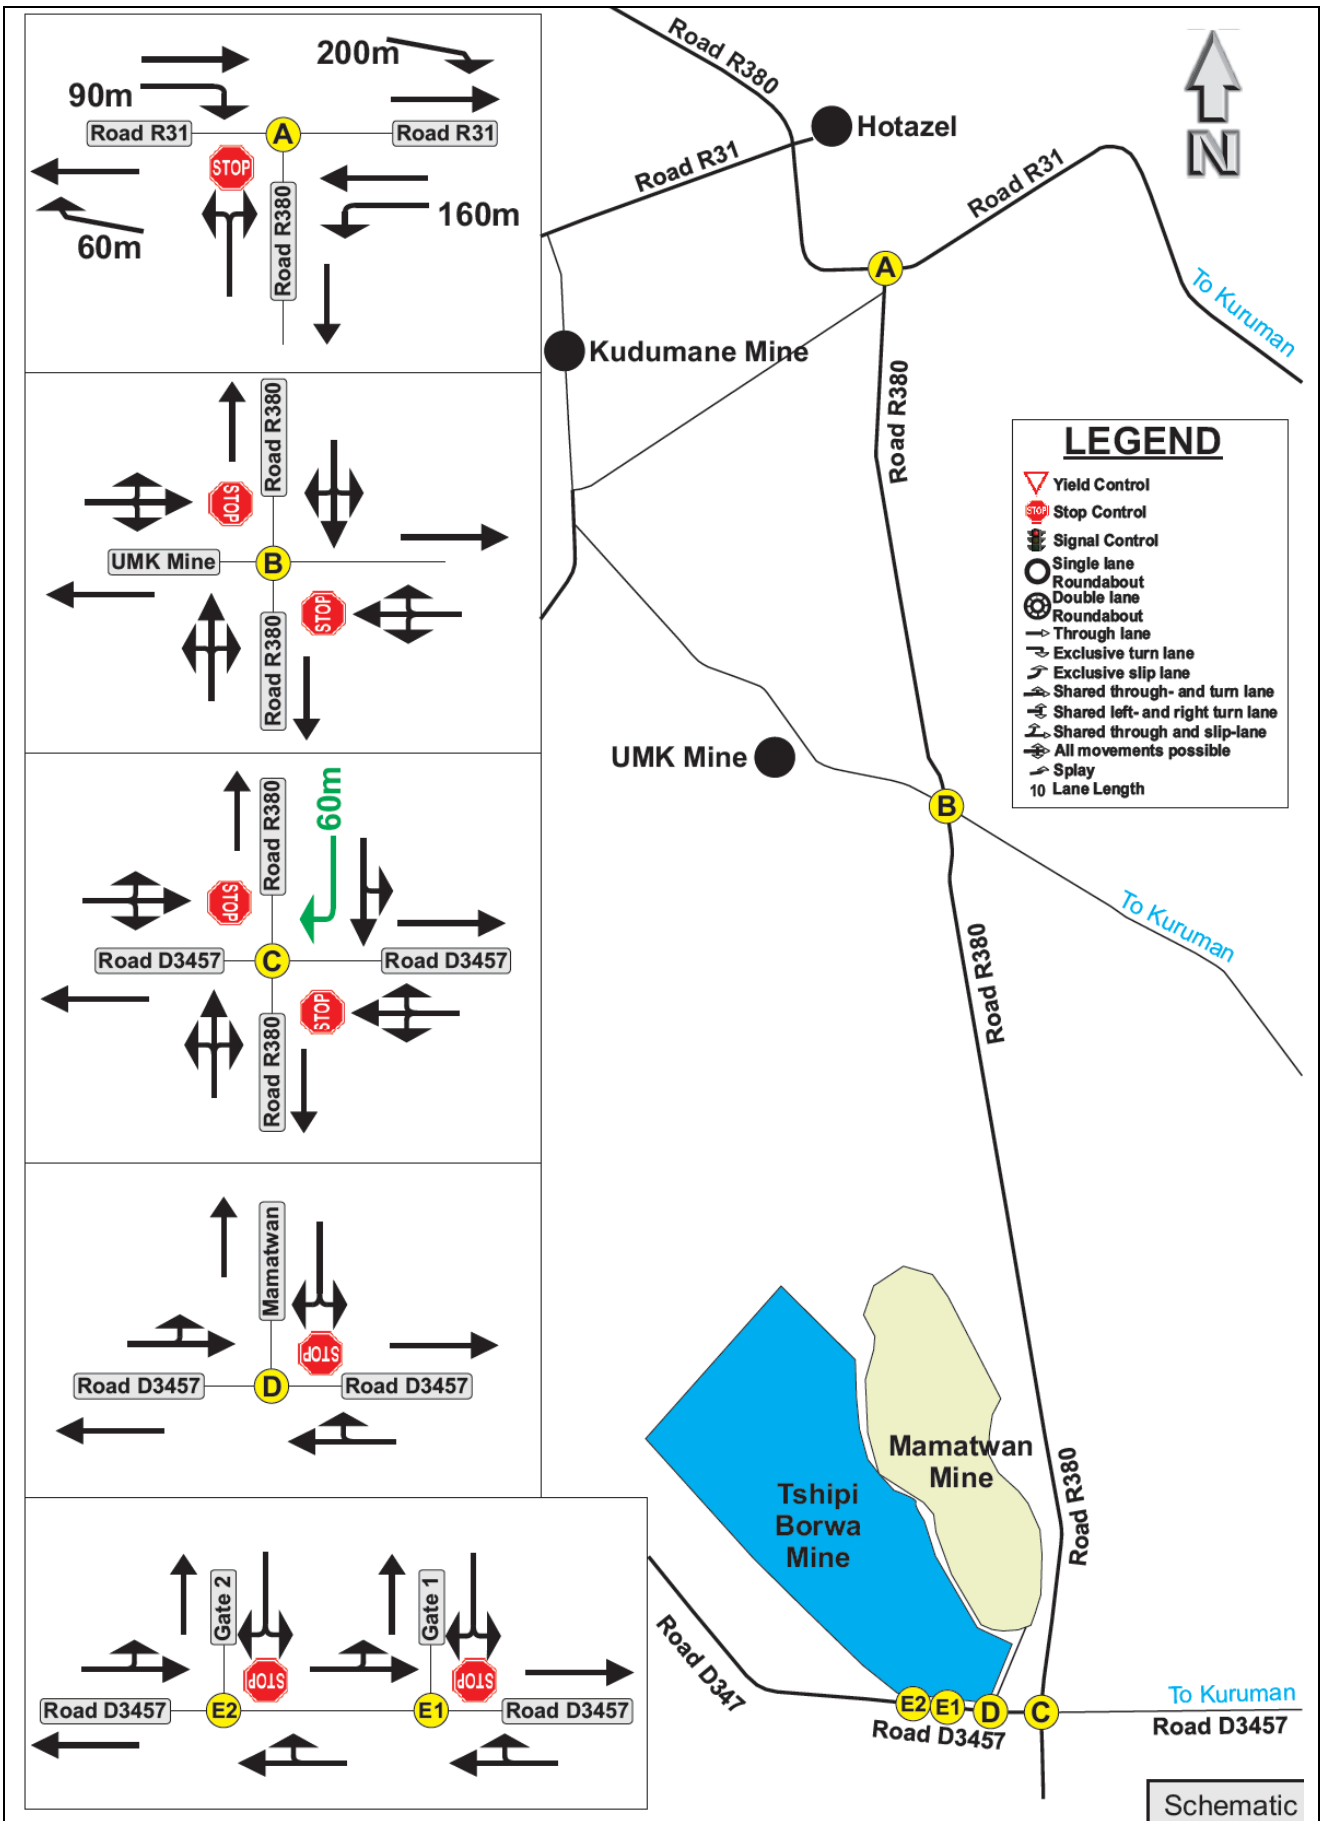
SCHEMATIC PRESENTATION OF THE RECOMMENDED ROAD NETWORK LAYOUT
